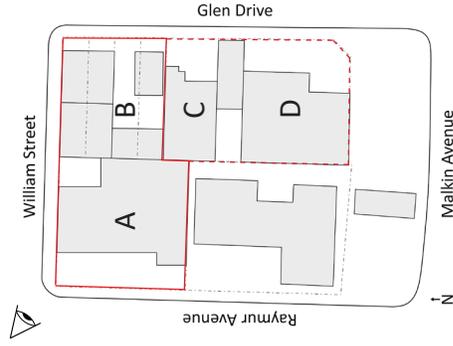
Intersection of William Street and Raymur Avenue facing northwest corner of Site A with the site's "AB(CD)" design intervention
